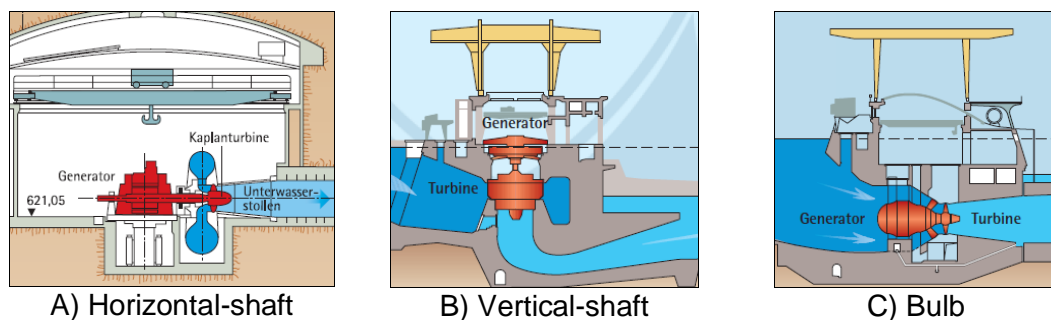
HHP design elements: Main shaft settings<sup>30</sup>
